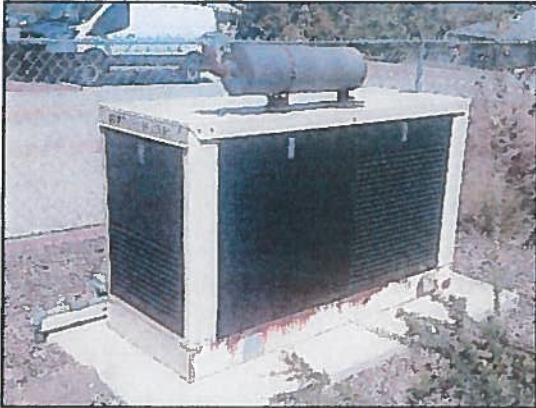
Fire Station 2 – Rusting at base of generator exterior
